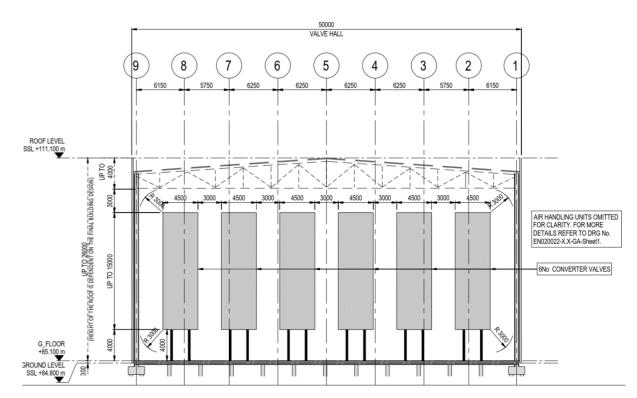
Converter building design Section view 2, extracted from indicative drawing EN020022-X.X-CHLP-Sheet1 in Appendix 1 (not to scale)
